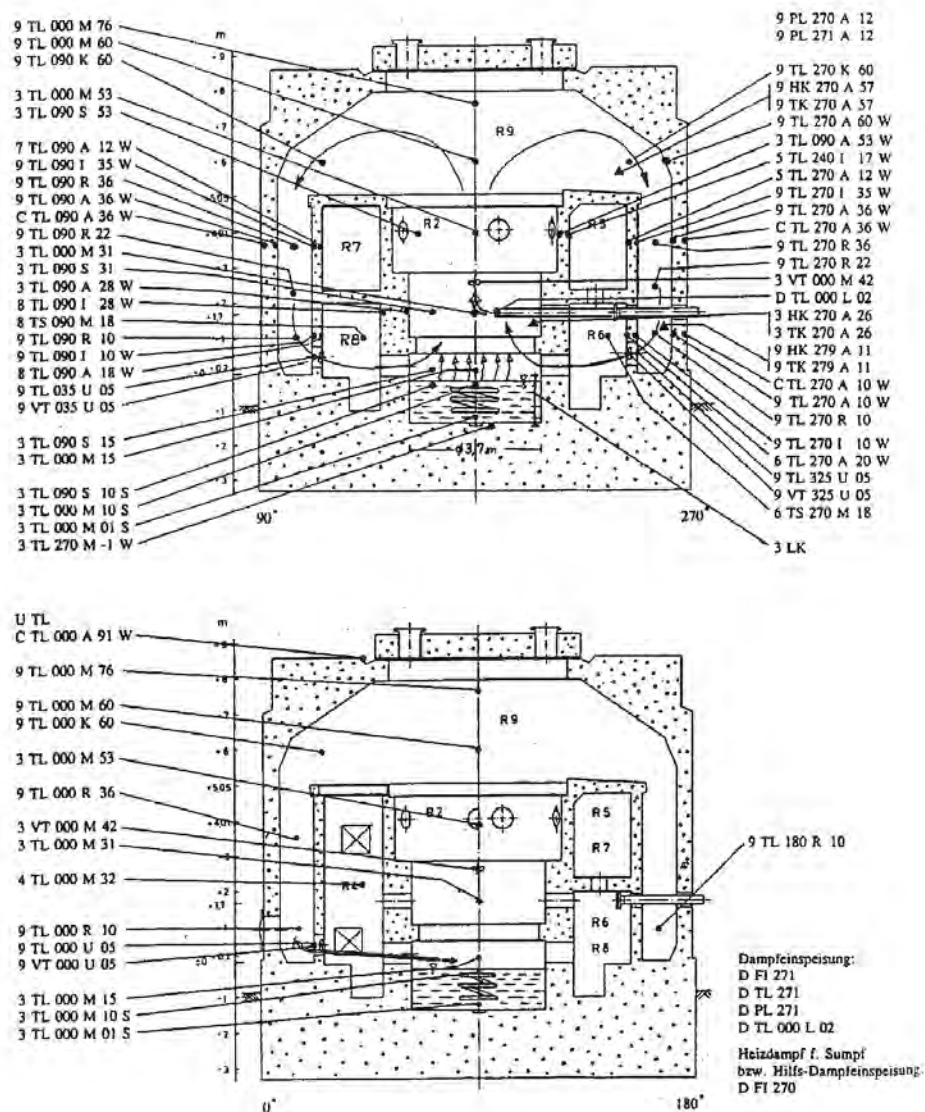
C-47. Instrumentation Plan for BMC – Sump Heatup Test RX4
